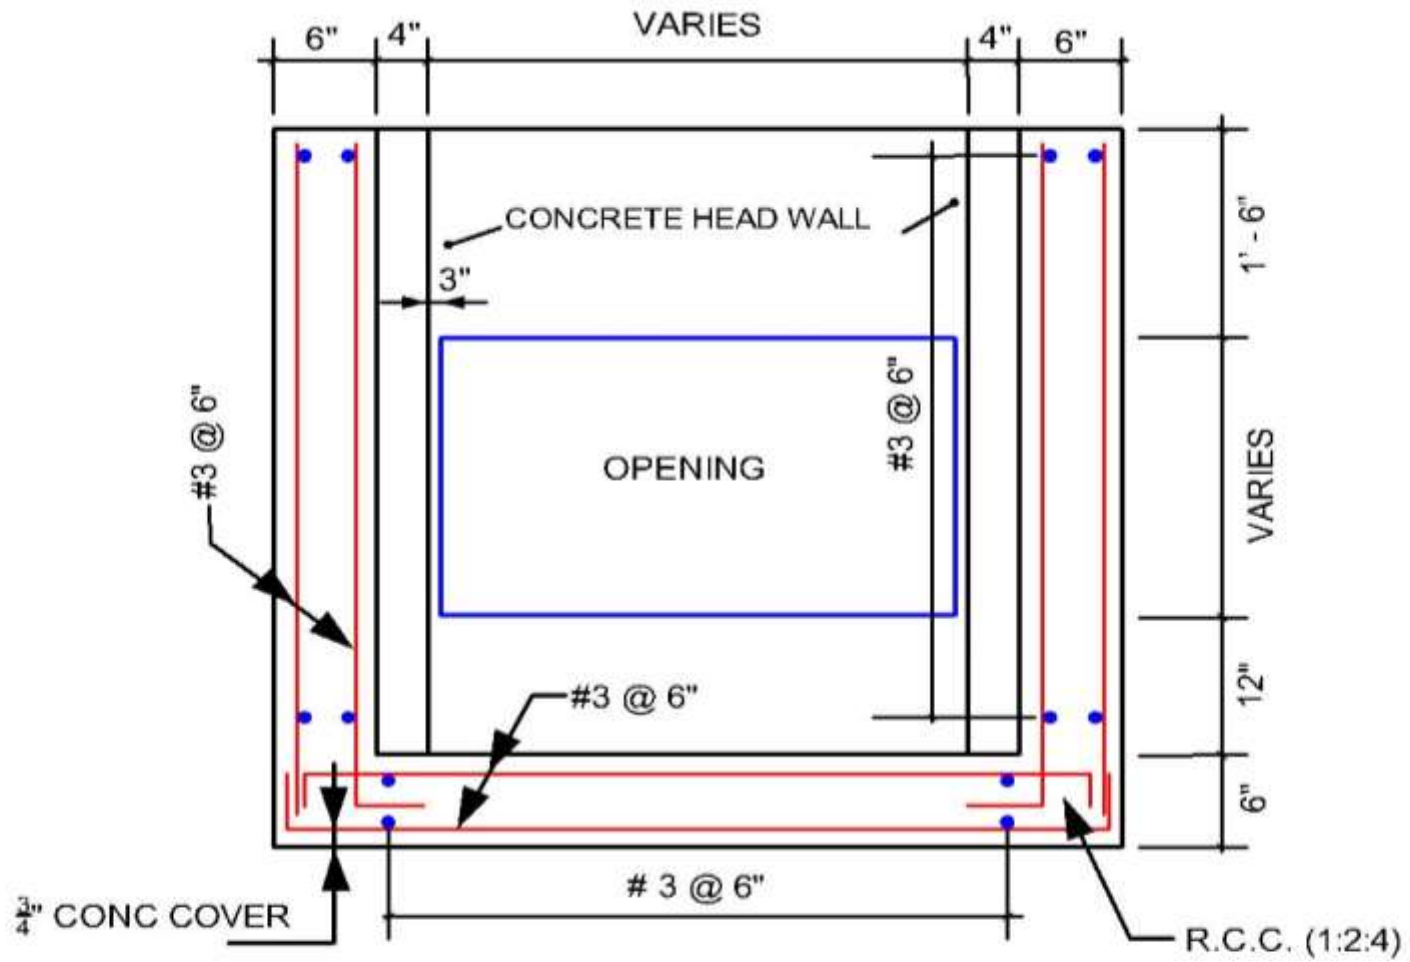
Plan view of outfall drainage structures at outlets of separated storm drains used in both systems
